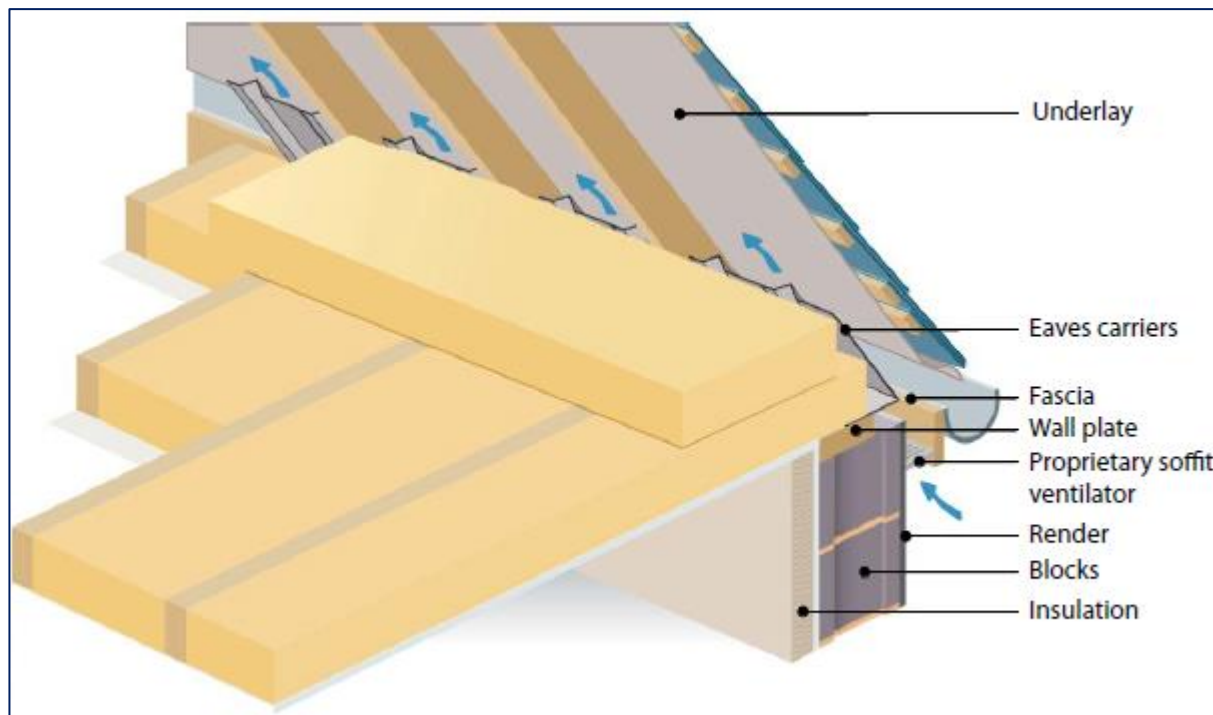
Cross-section through a Roof showing Ventilation at Eaves Level
